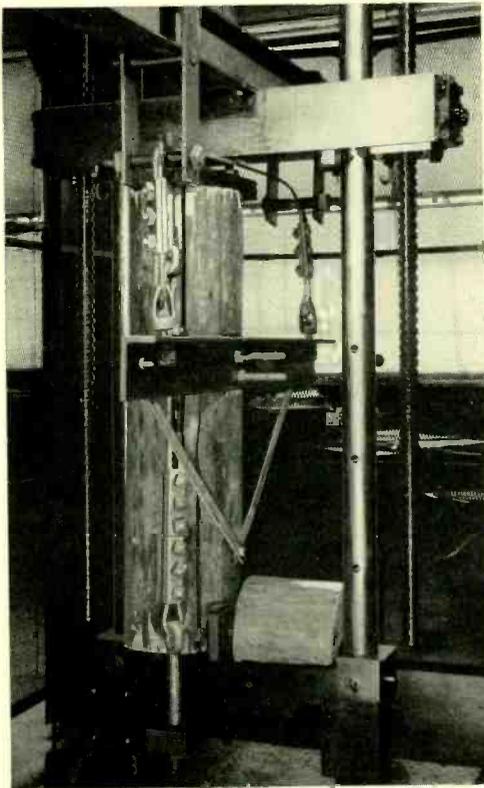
The strengths of steel crossarms and attaching bolts are determined by mounting them on a pole section in the Amsler machine. The braces are removed before testing
